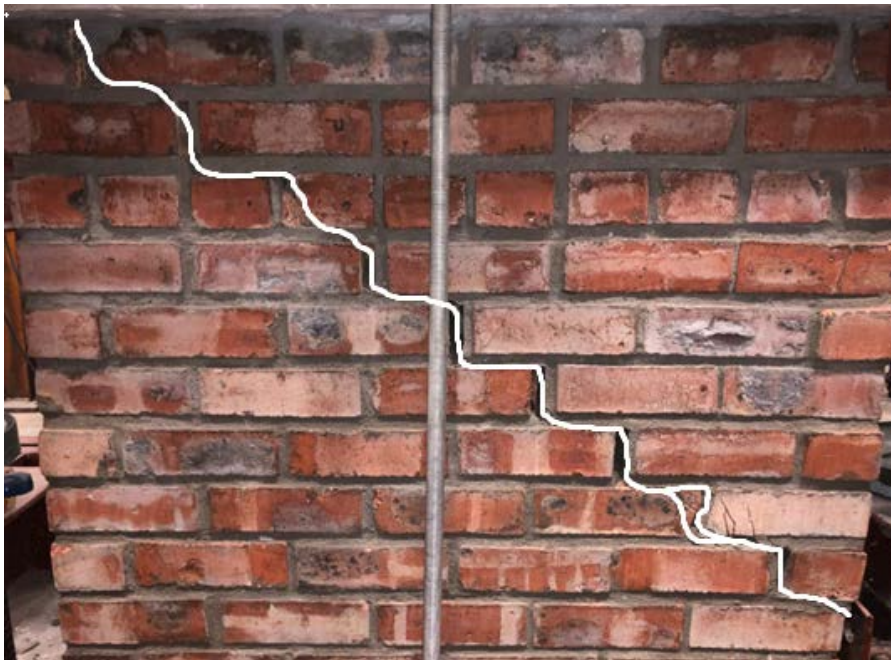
SW-220-15-No Strips crack pattern in the masonry.
